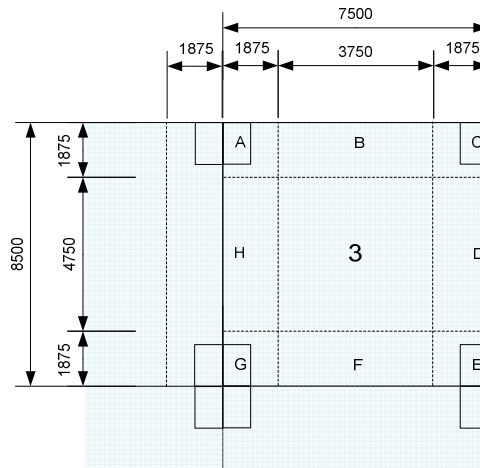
Dimensioning details for Panel 3 for the parking deck.
